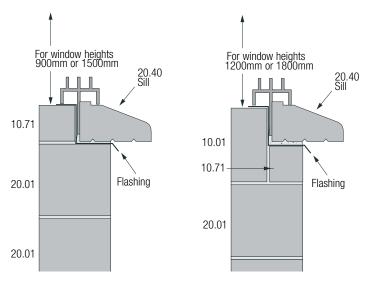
Sill Detail - Single Skin Wall Series 200 Feature Face Designer Block
